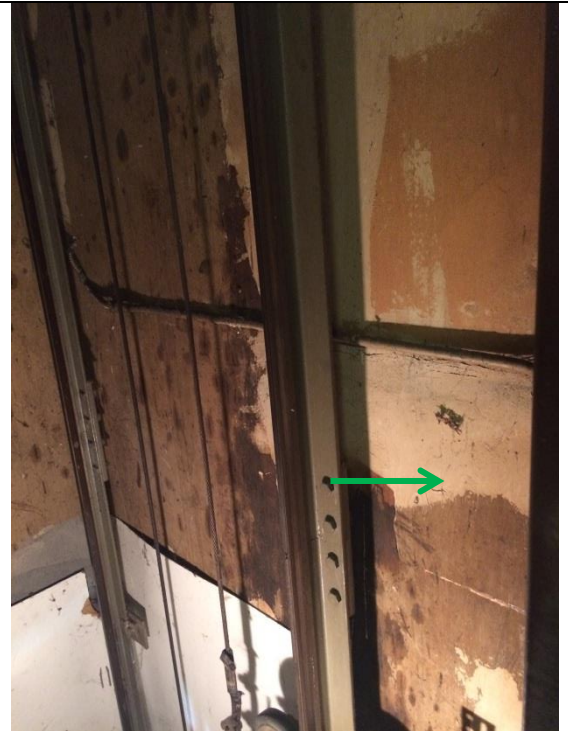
Unpainted Plaster walls in elevator hoist are non-asbestos.
